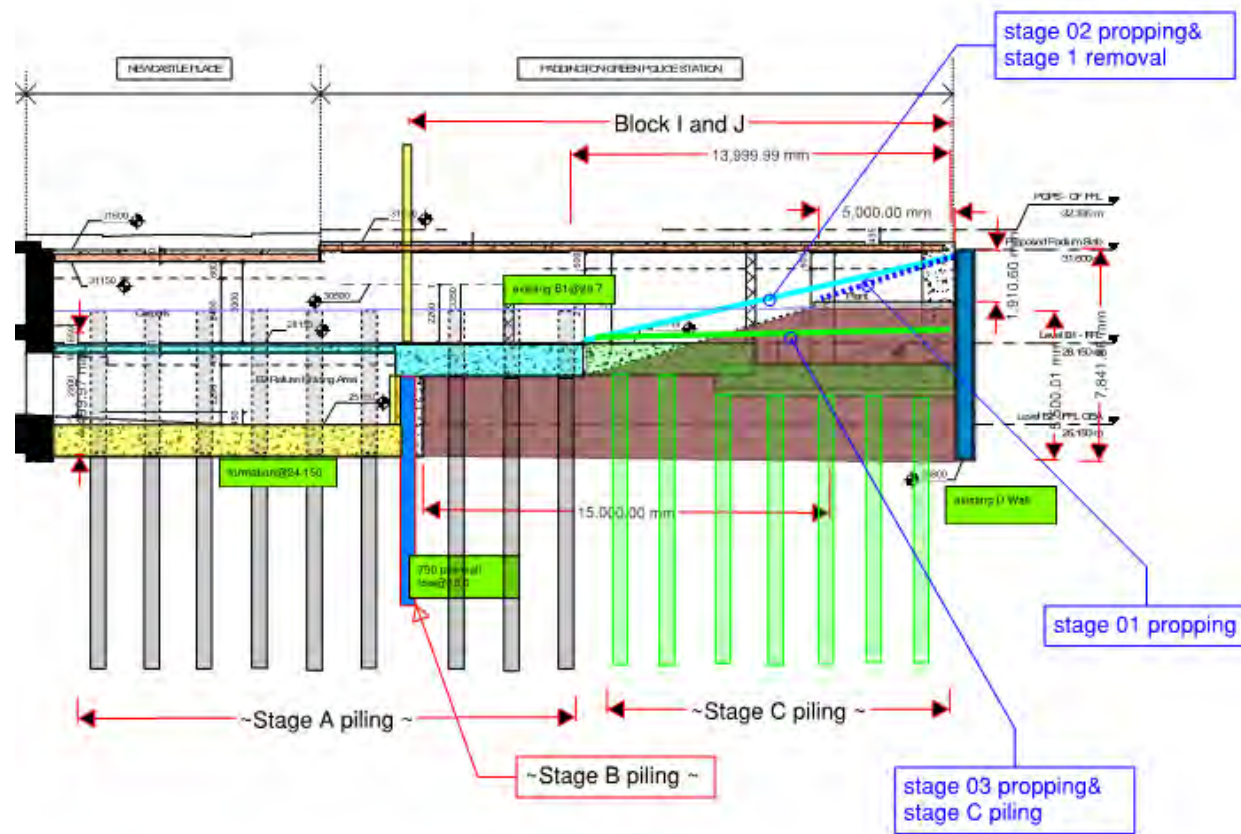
Proposed construction sequence of New basement and existing D Wall
